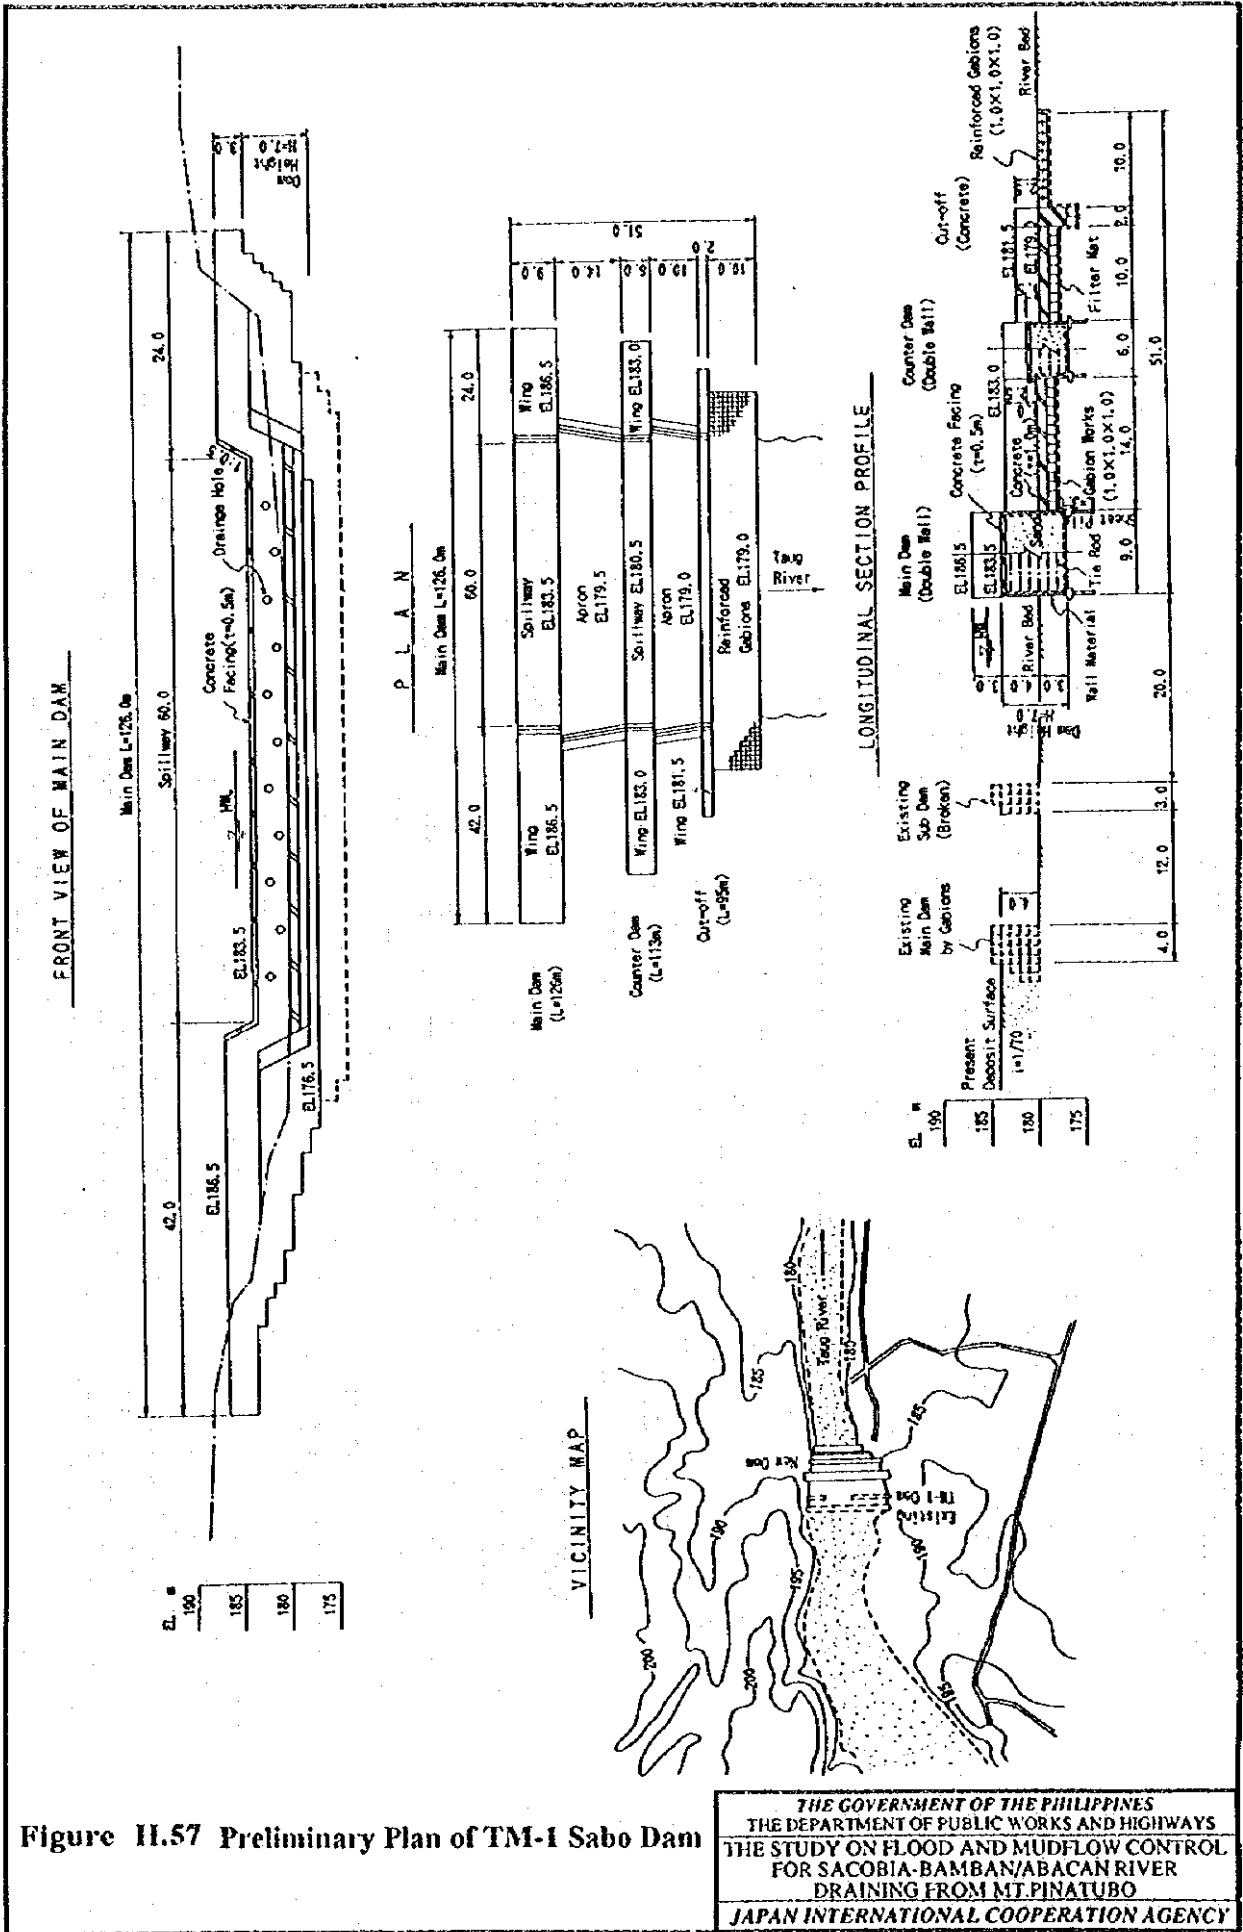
Preliminary Plan of TM-1 Sabo Dam
